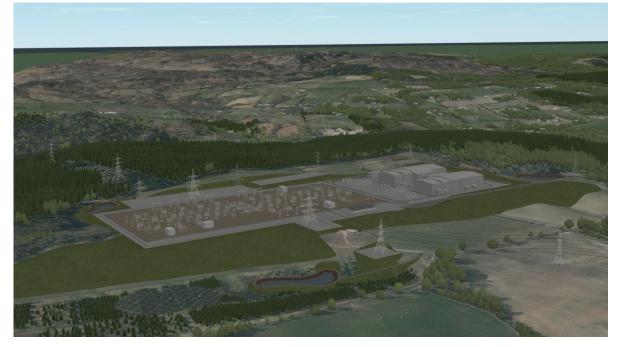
1 3D Model showing indicative 400 kV Substation and Converter Station layout
